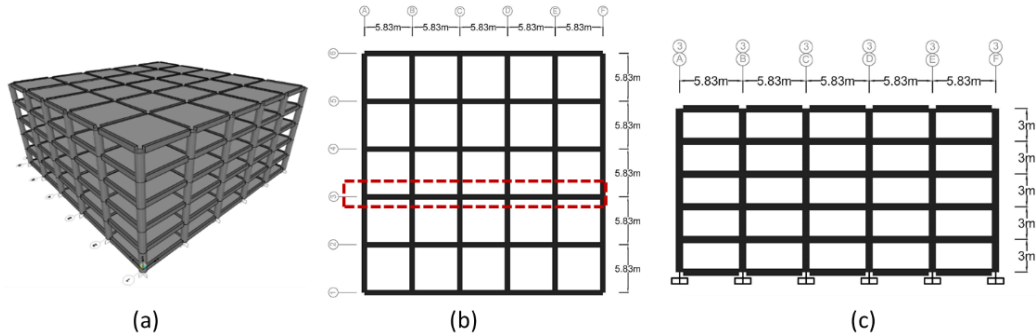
Selected 2-dimensional structure from the proposed building (a) Three-dimensional, (b) plan and (c) elevation view
